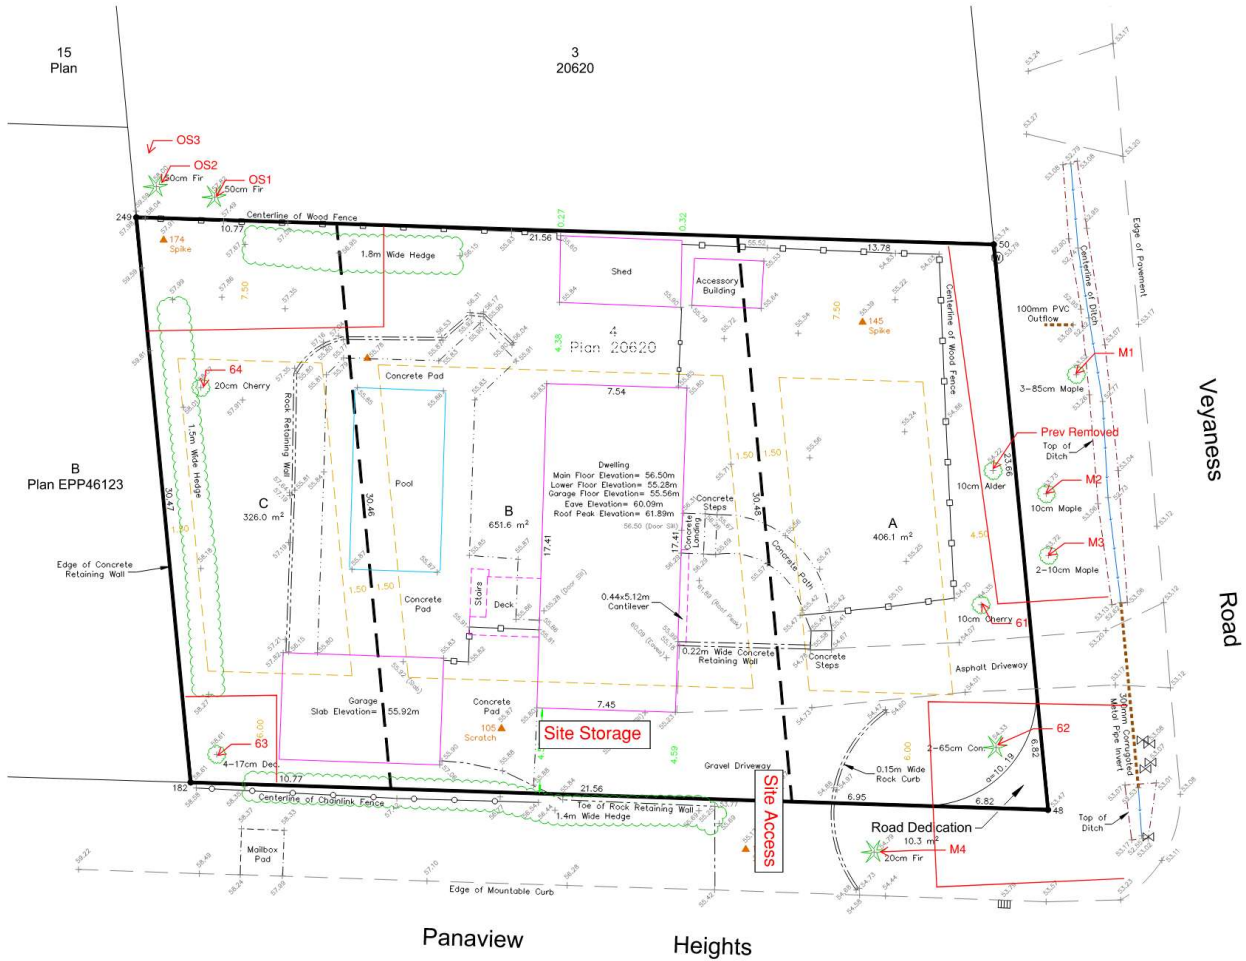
Site Plan. Red lines indicate Tree Protection Fencing. See Appendix C for Tree Protection Fencing specifications.
